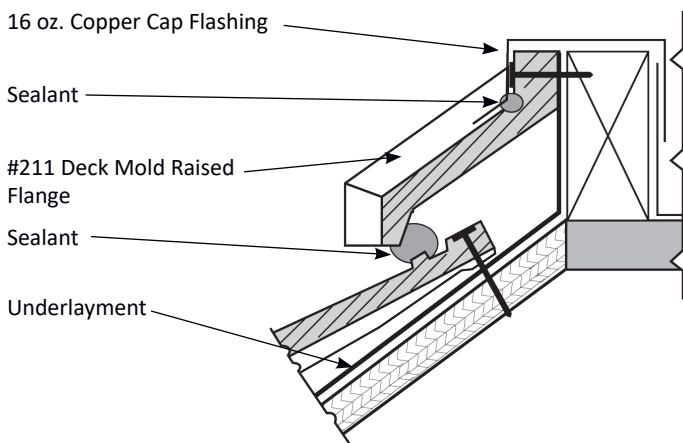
Deck Section with #211 Deck Mold Raised Flange
